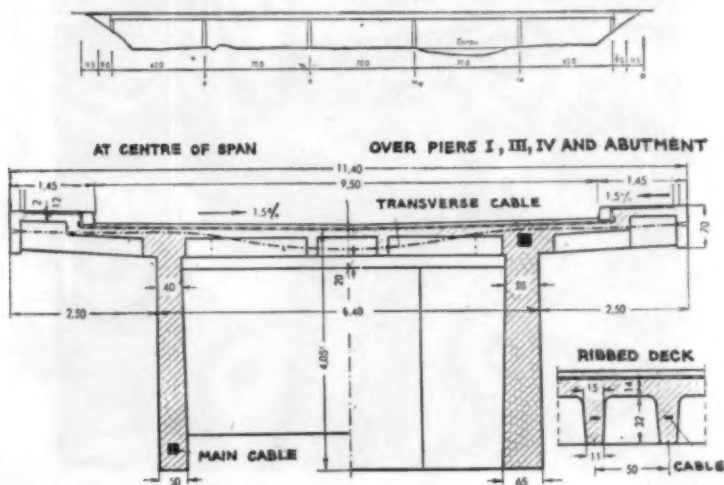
Danube Valley Bridge : Longitudinal and Transverse Sections.
